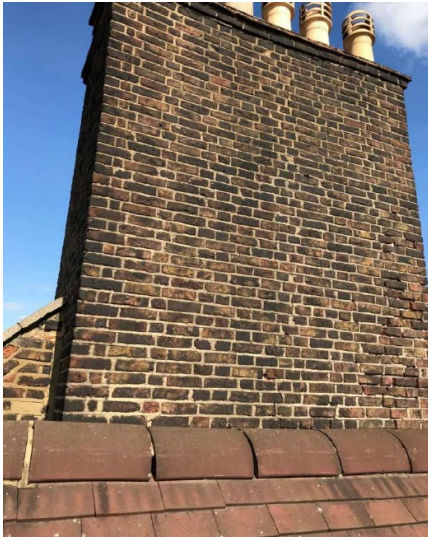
Roof Chimney Stack to be repointed and Terracotta tiles to be repointed as part of maintenance works.
